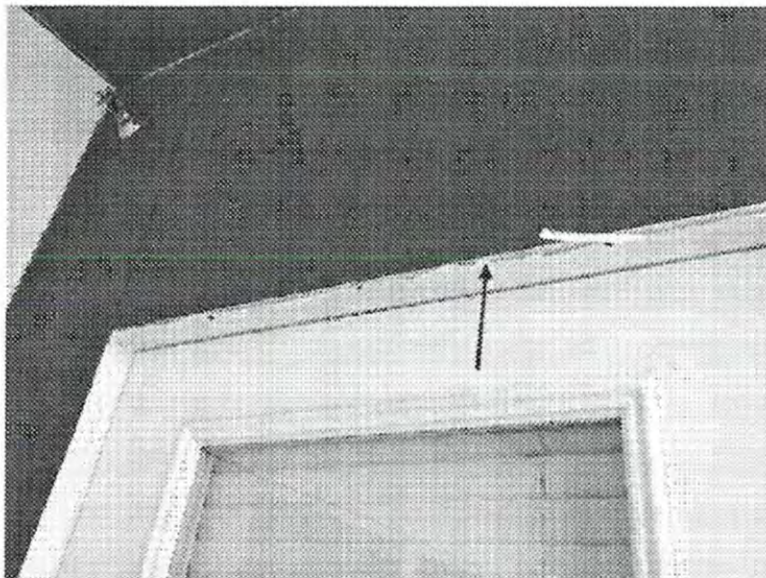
Lack of weep screed at balcony door head, as well as apparent damage to head flashing.
